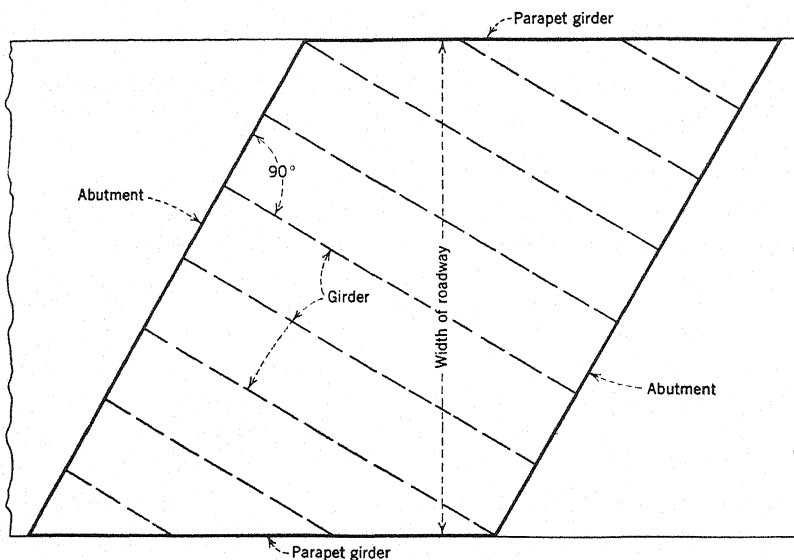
Arrangement of Girders in Wide Skew Crossing. (See p. 56.)
